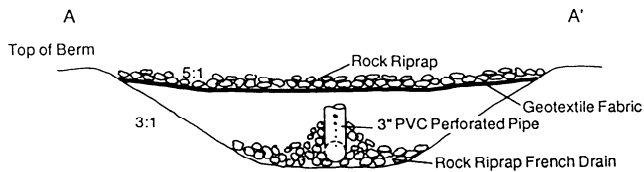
Plan view (cross section A-A¹) of dewatering type of internal check dam. Conversion factor: 1 in. = 25.4 mm.
